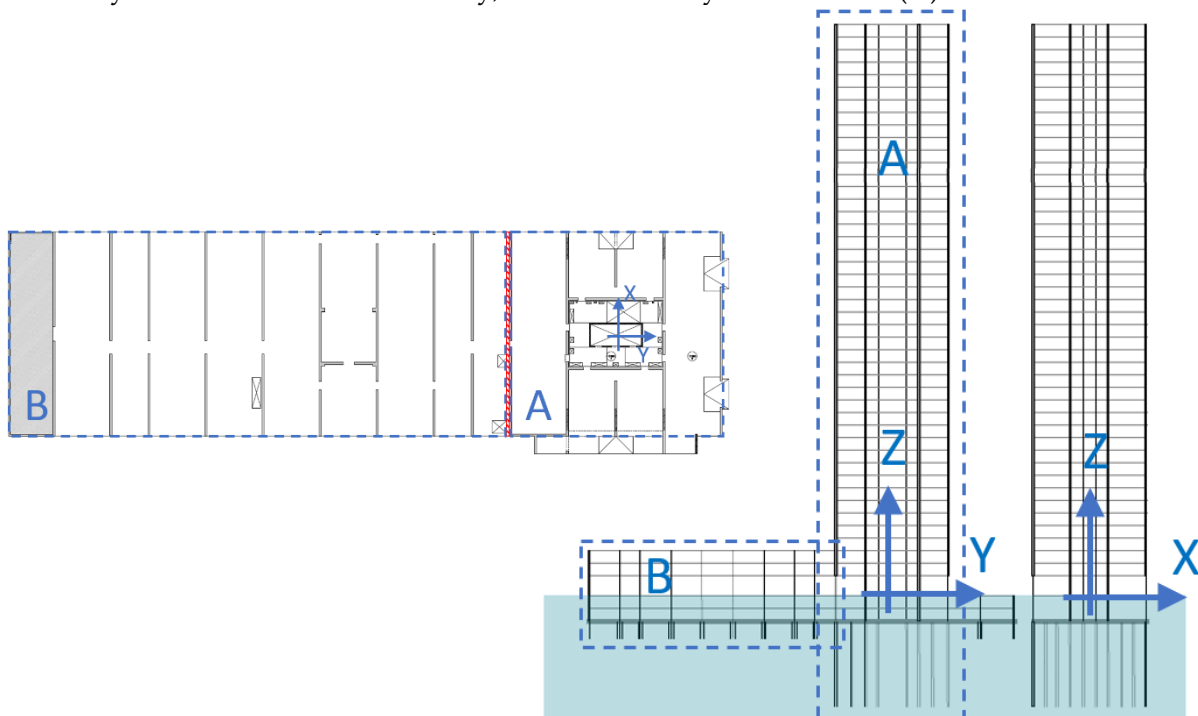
Cross-section and plan view of the New Orleans Tower, showing the tower sections and reference frame.
